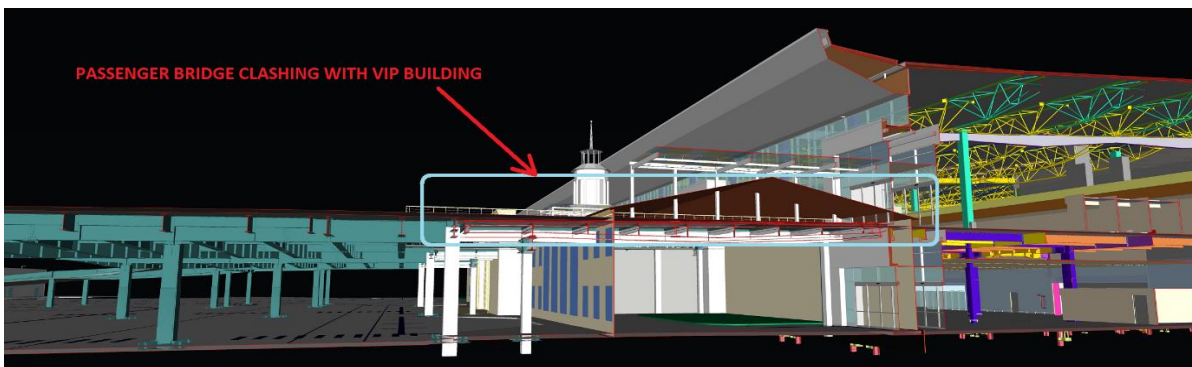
Landside elevation showing access ramp in front of VIP terminal building
